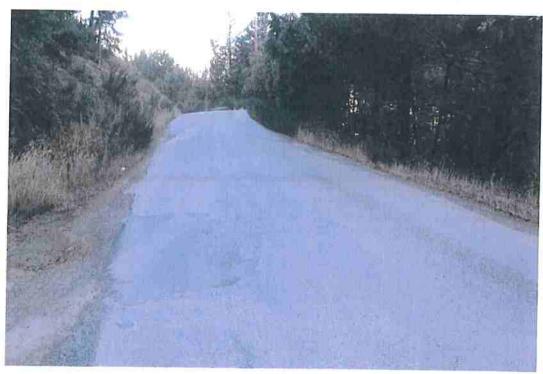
Mile 2.7: 20-ft road width with 2-ft shoulders.
